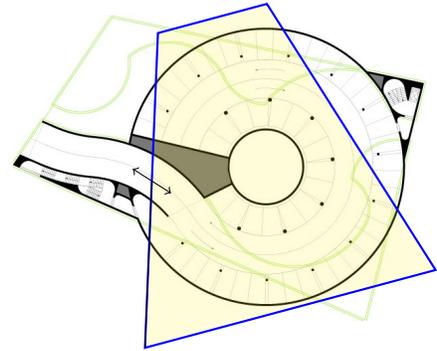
Plan view of the Josephsplatz construction site with camera view overlay (opaque trapezoid).
